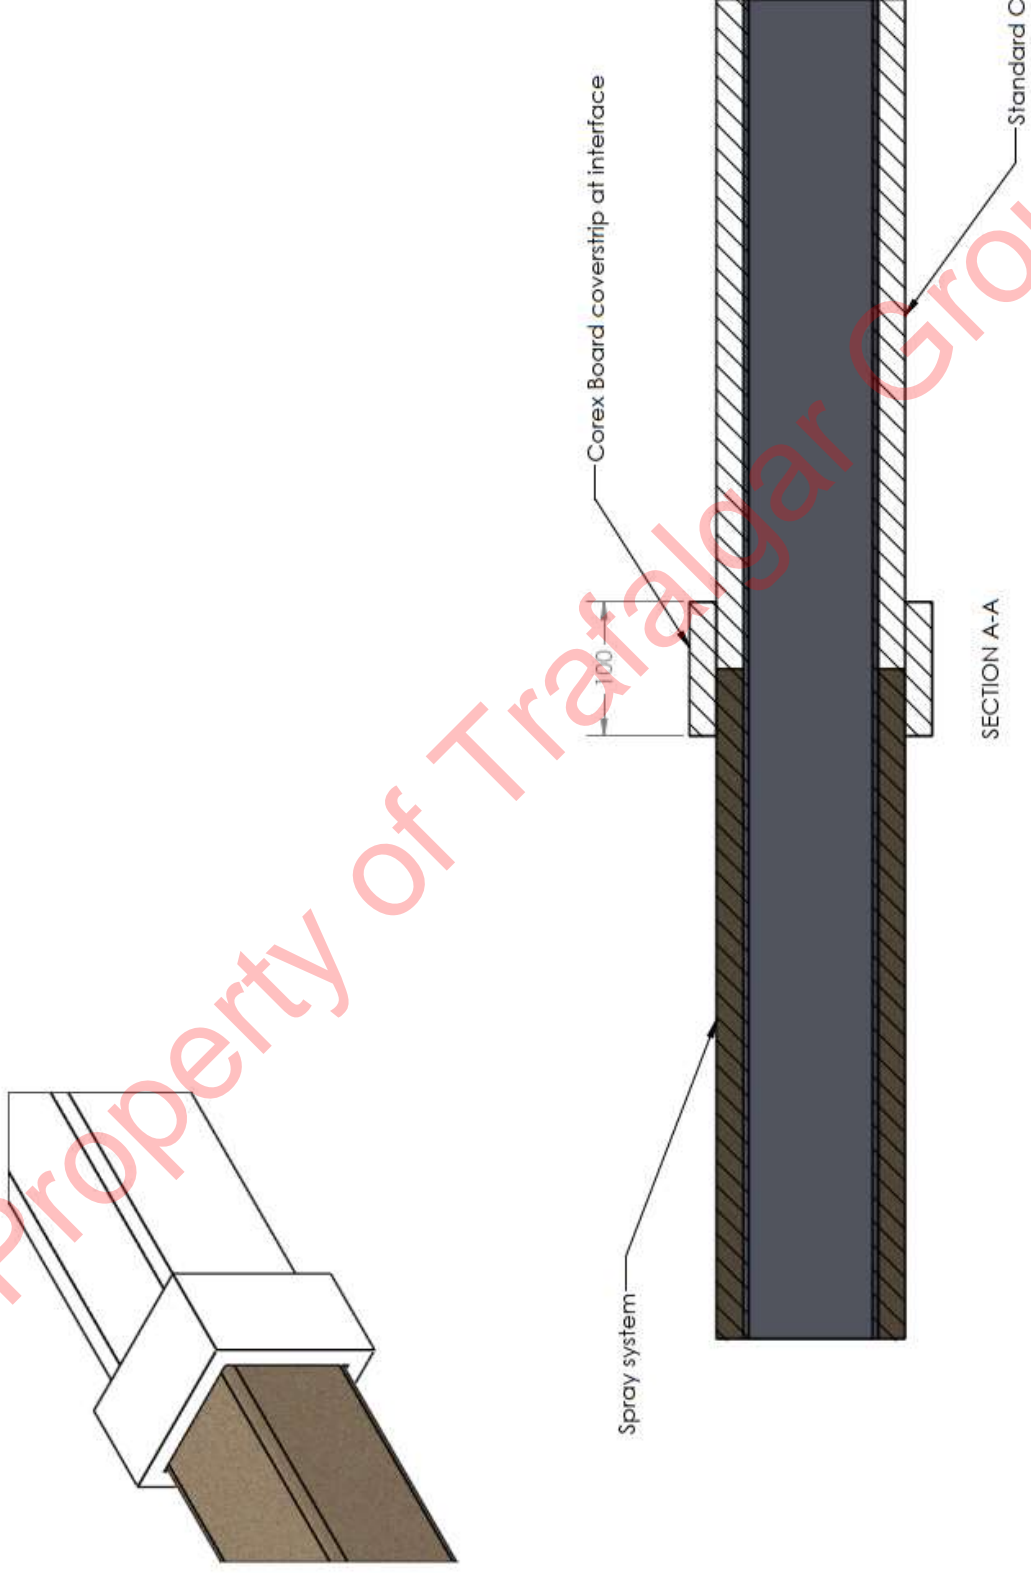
The construction detail when the board protection system is added next to the existing spray protection system – Option 2
